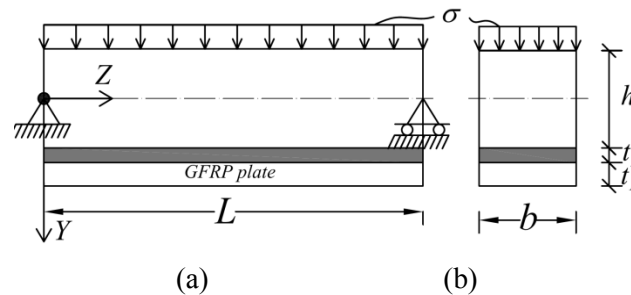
Wood beam strengthened with GFRP (a) elevation and (b) cross-section
